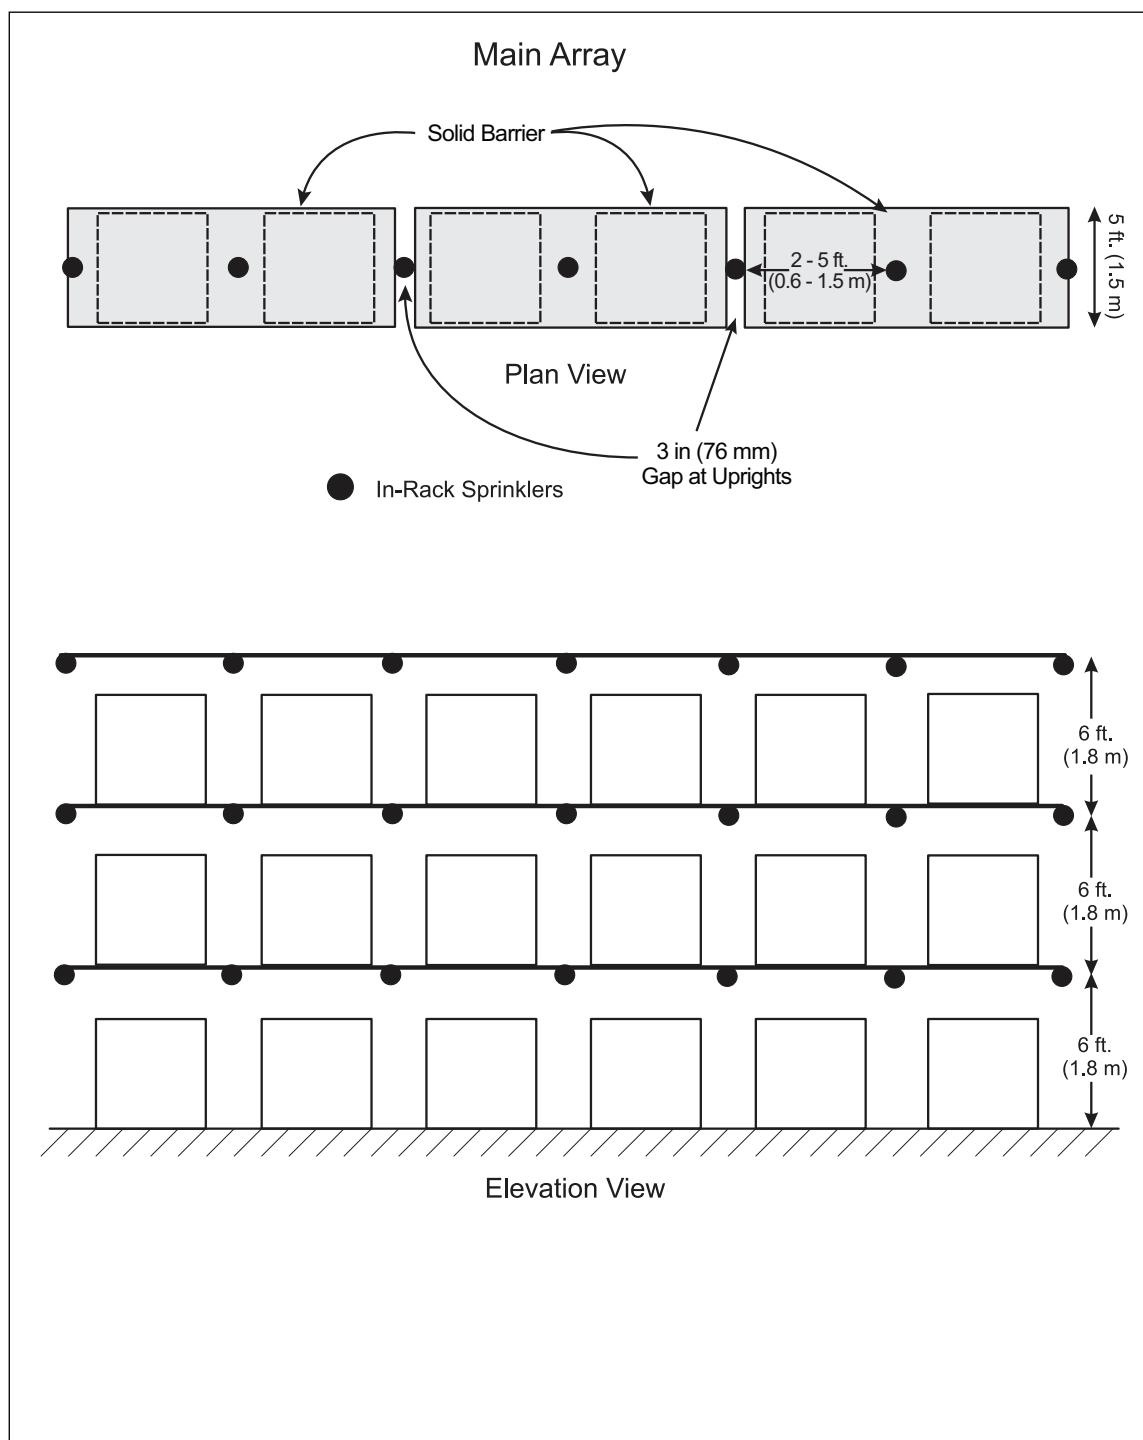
Single row rack sprinkler layout: fire protection scheme F
